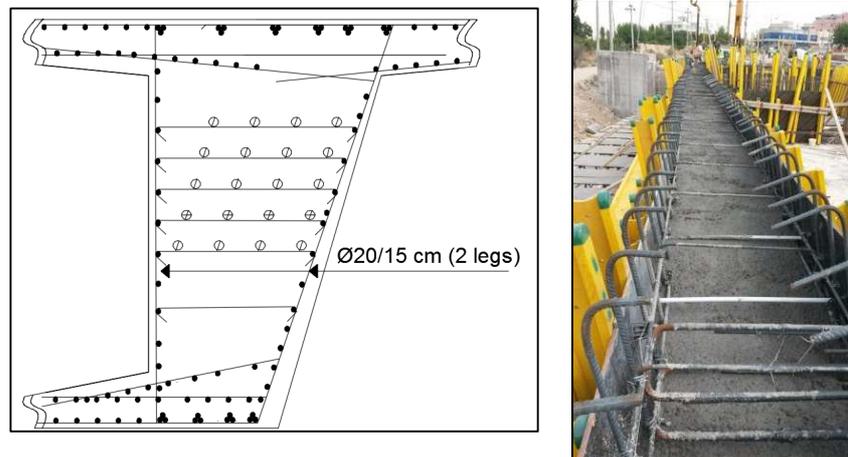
Shear reinforcement at anchorage zone and interface between web and slab
